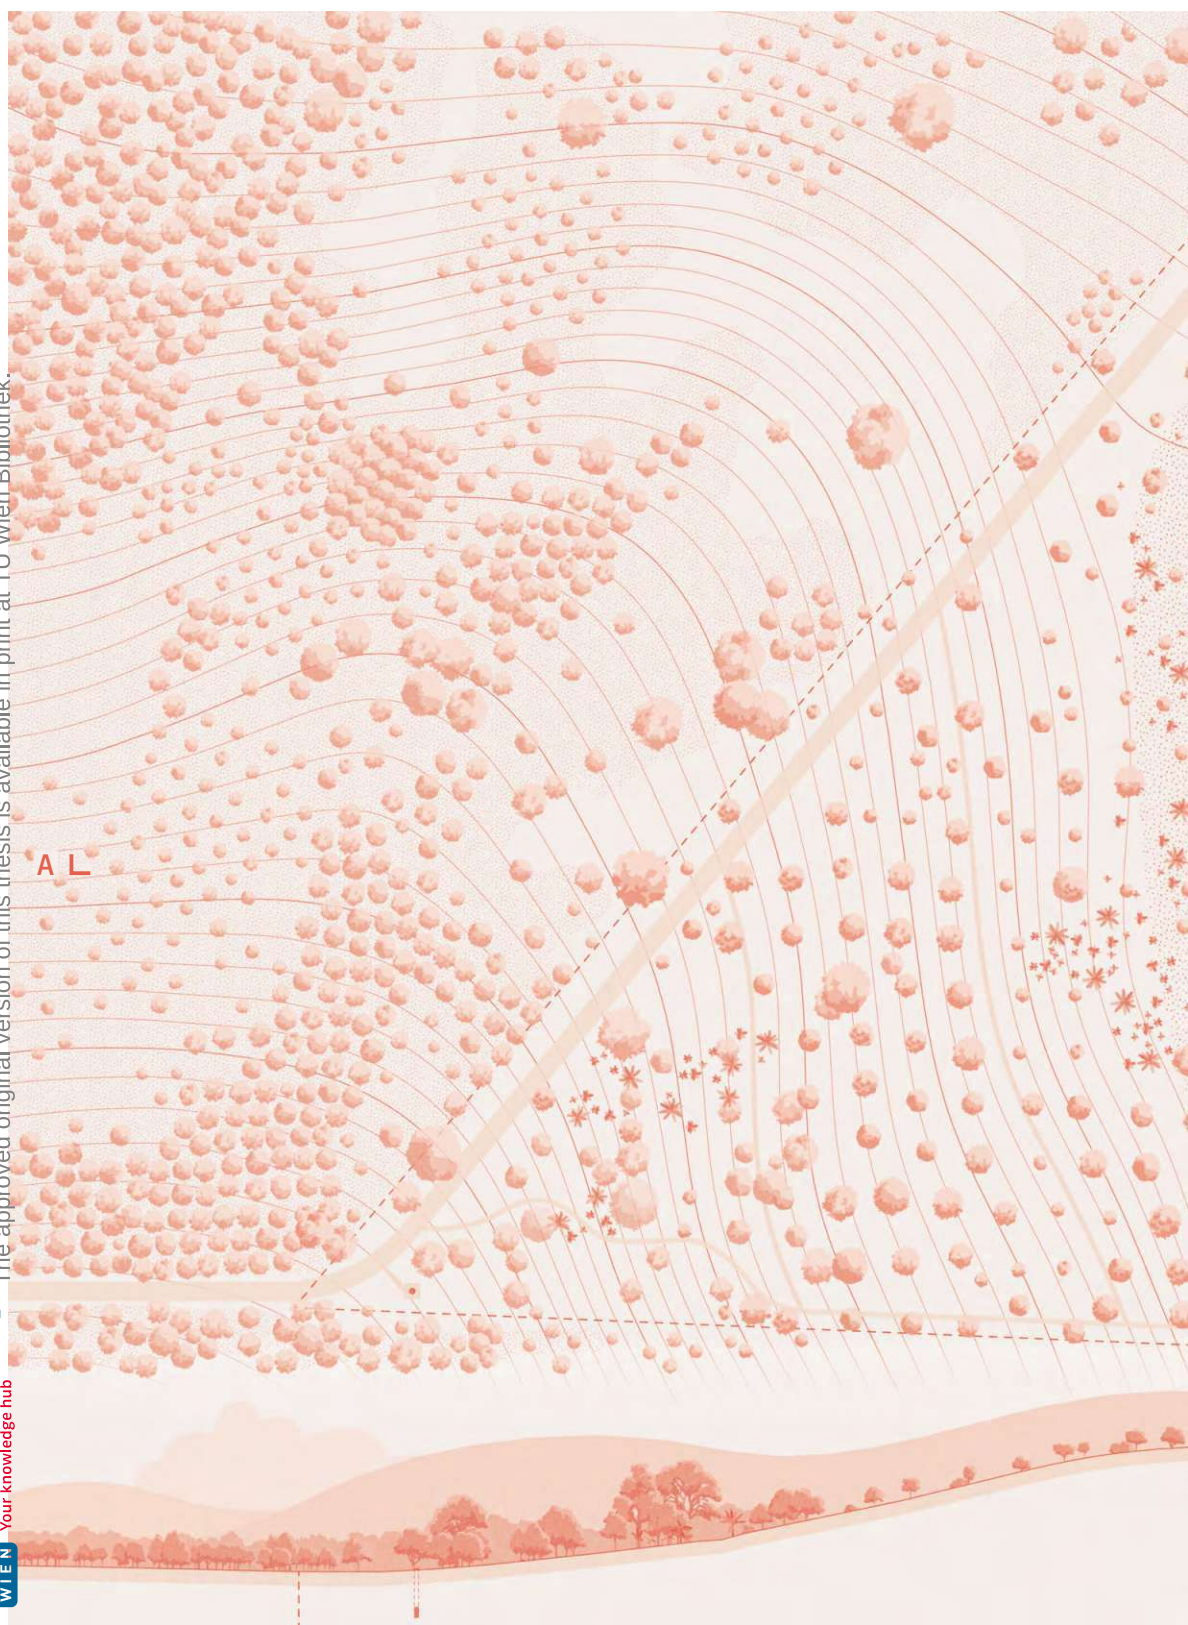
Site plan and cross-section of Bowa Hill; no scale.
